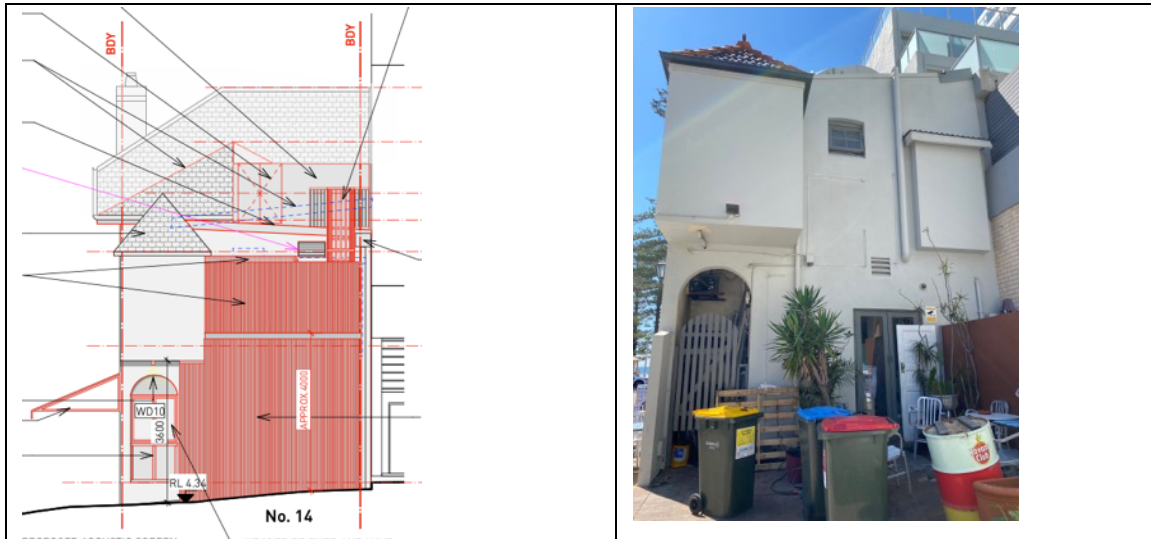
, South-West Façade: New fresh air intake louvre grille to mechanical engineering details.
